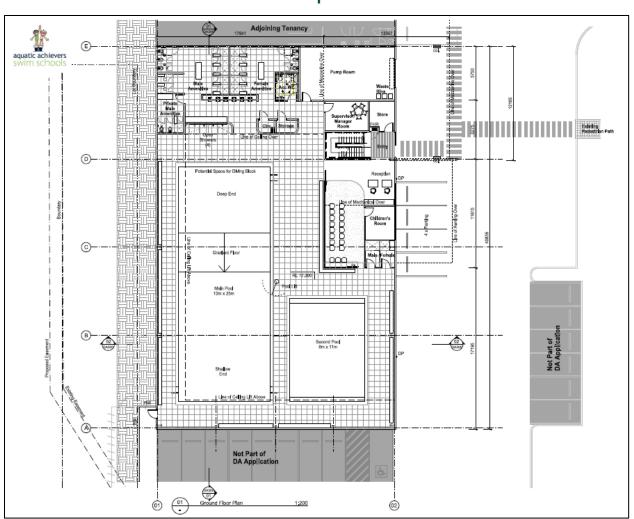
Proposed Floor Plan (Source: SBA Architects, 2022)
